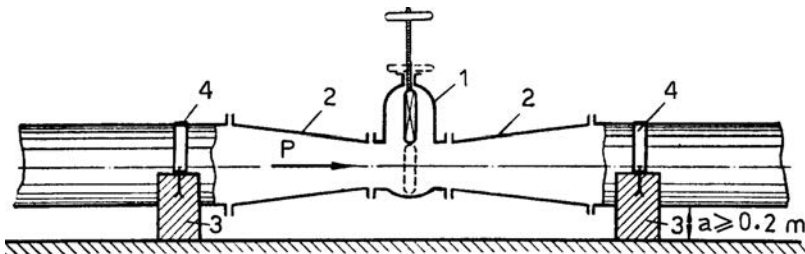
Reducing the diameter of the pipeline at the valve. (1) Shell of the valve; (2) conical pipe; (3) concrete block; (4) steel pipe-jointing clip.
